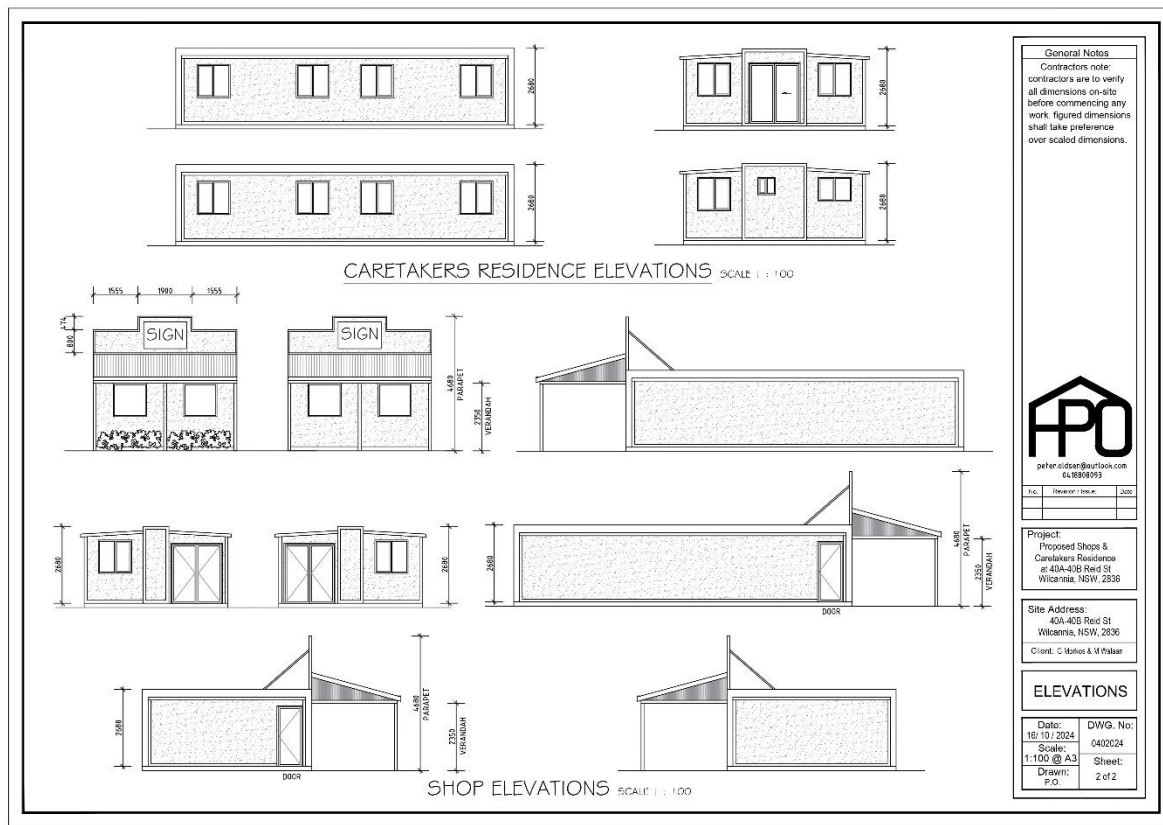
Proposed Elevations New Shops & Caretakers Residence 40A- 40B Reid St Wilcannia
